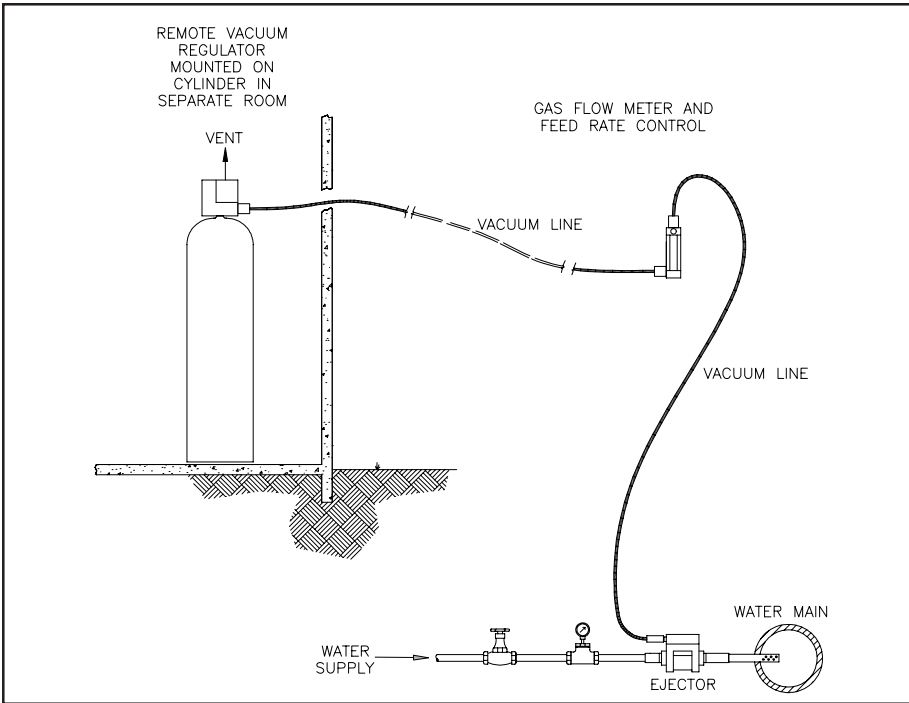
Remote Vacuum Regulator and Flowmeter With Pipeline Installed Ejector
